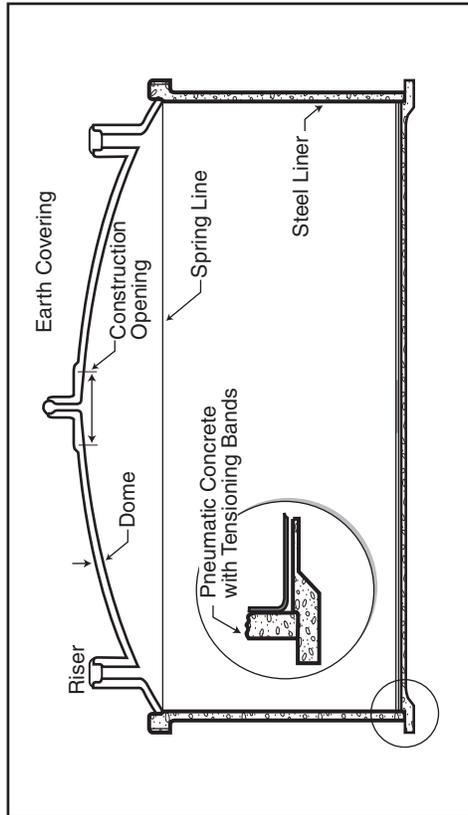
C. Uncooled Waste Storage Tank, Type IV (Prestressed concrete walls)
